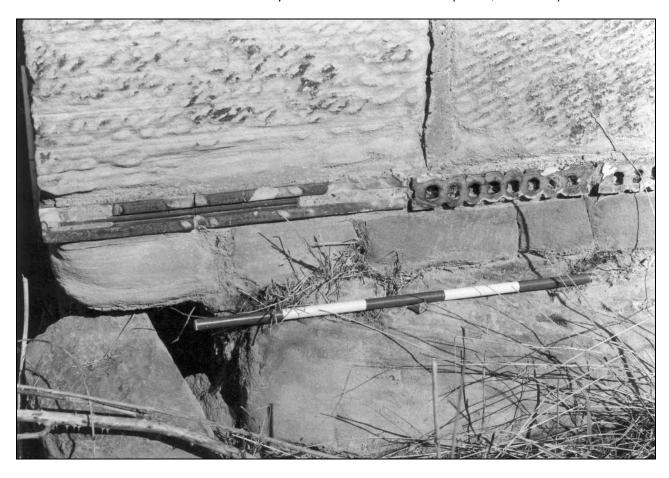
Detail of damp-course, north-west corner of house (film 5, frame 9)
